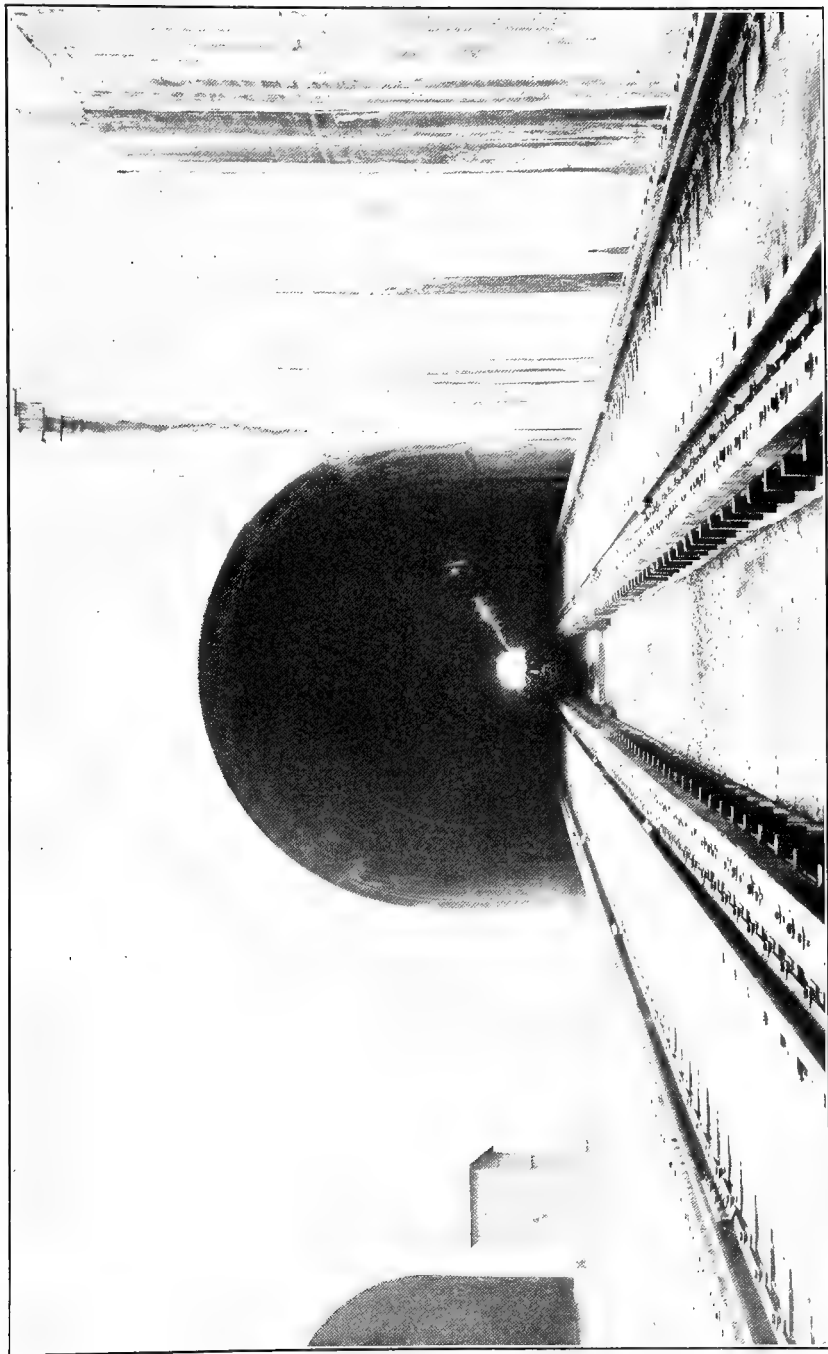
VIEW TAKEN AT ONE OF THE TWO OPEN SHAFTS IN THE INTERIOR OF TUNNEL SHOWING FINISHED ROADBED.
